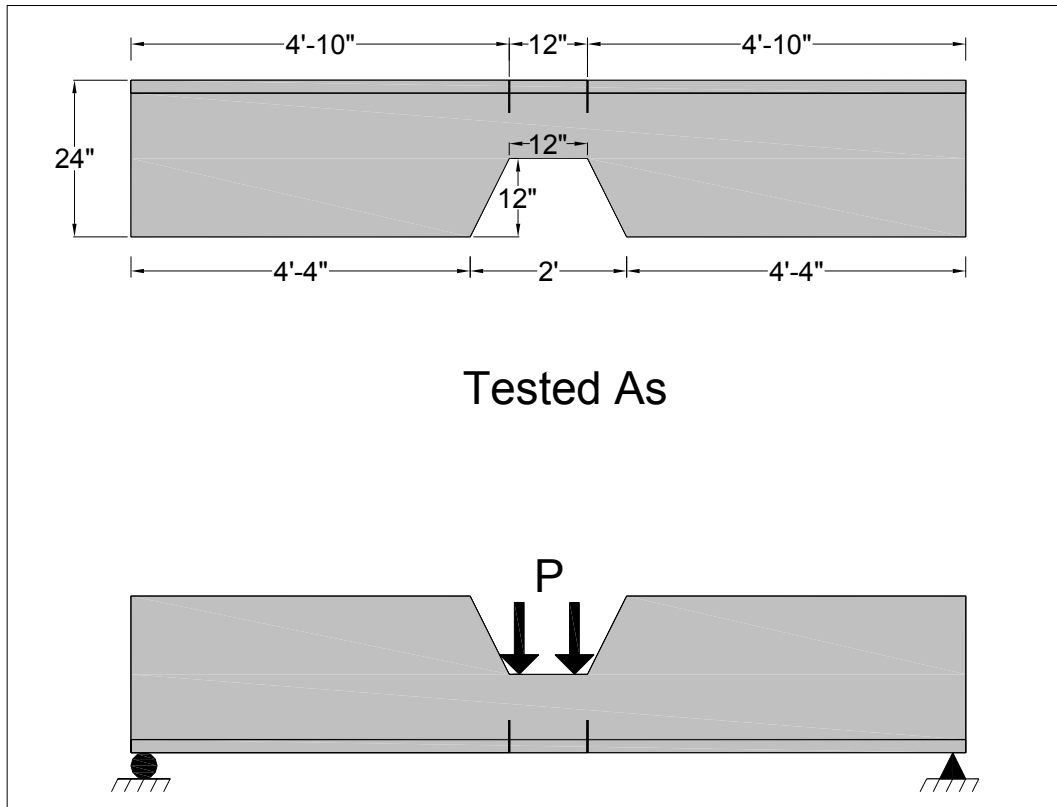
Test setup for 4'-10" embedment length TSB specimens
